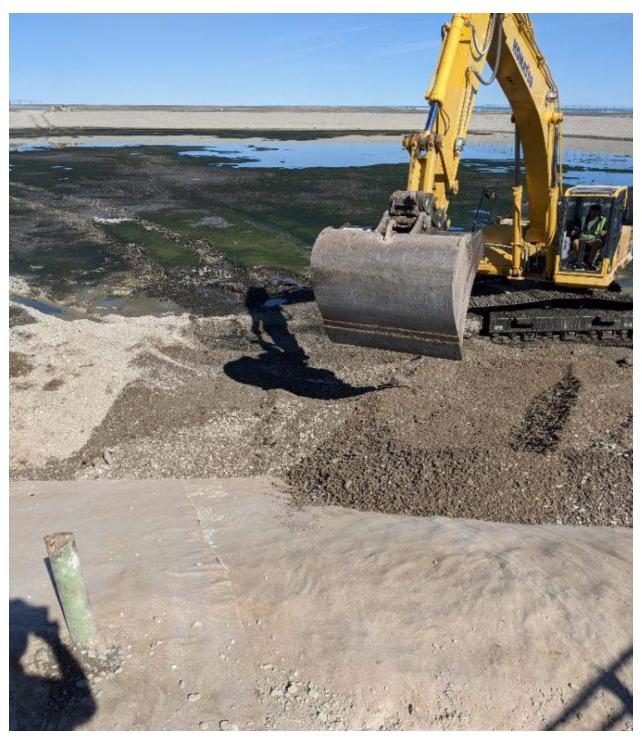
Liner was placed on embankment and tucked into anchor trench. Excess material was trimmed before burial.
